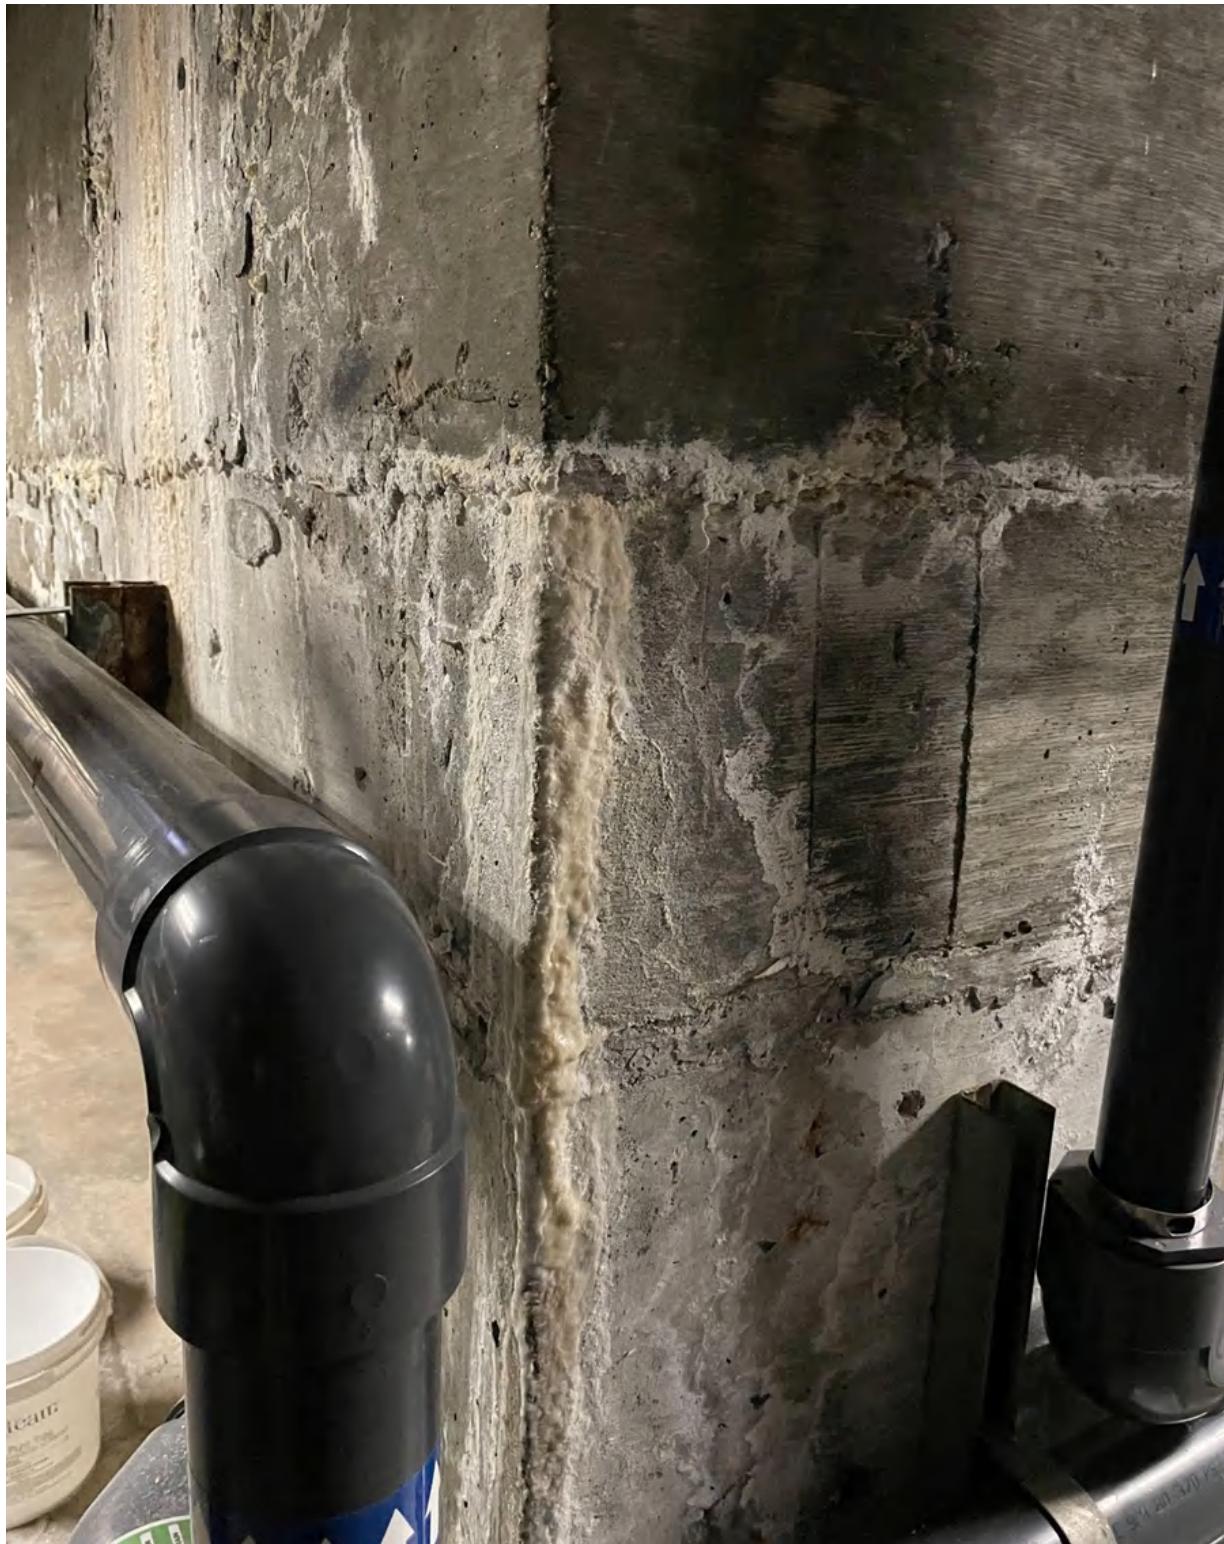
leak source appears to be from cold joint at the pool wall and lower slab
